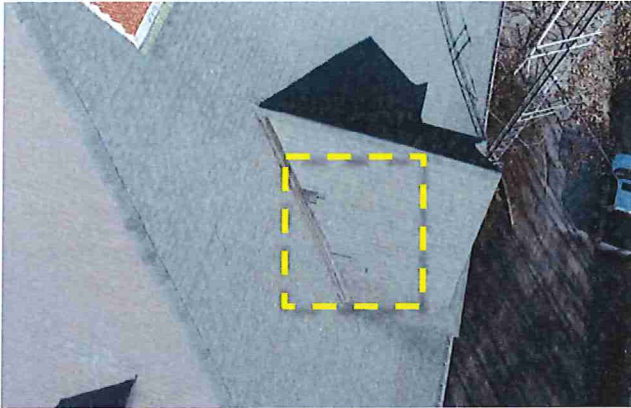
Drone image shows damaged and displaced asphalt shingles on the east dormer roof.
